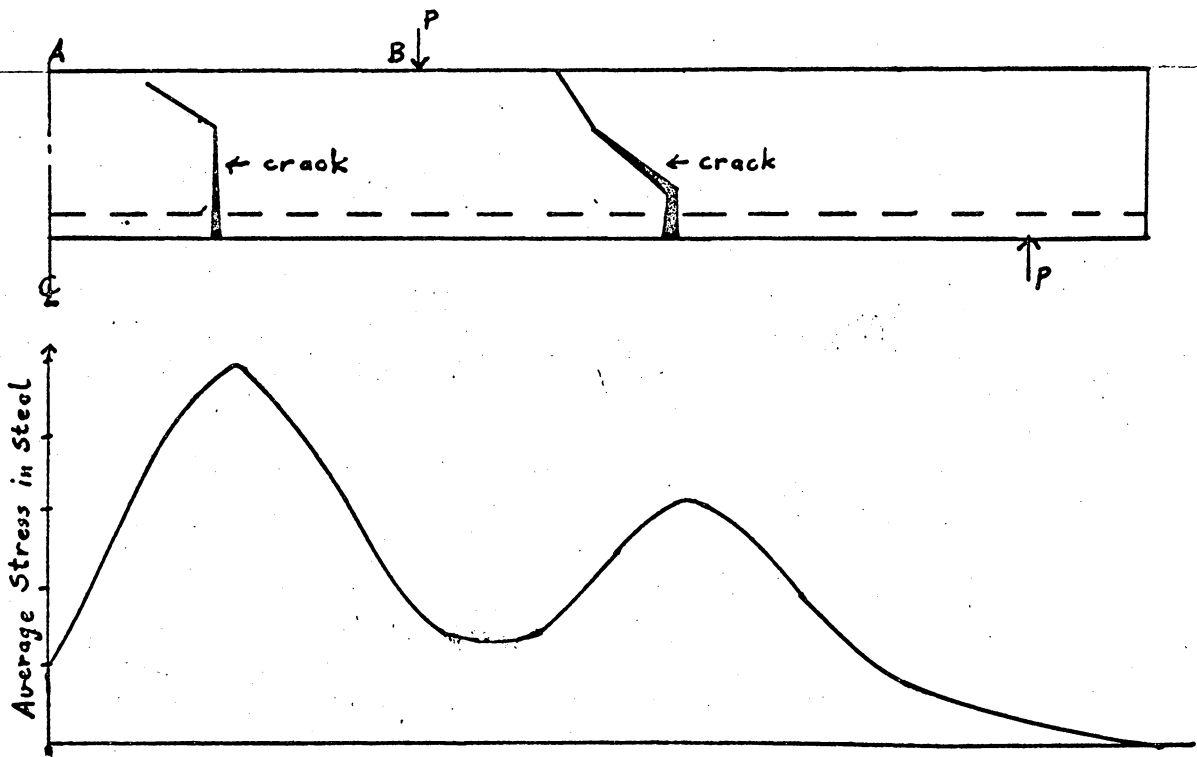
Stress-Distribution of the Reinforcement of a Beam with Cracks.
